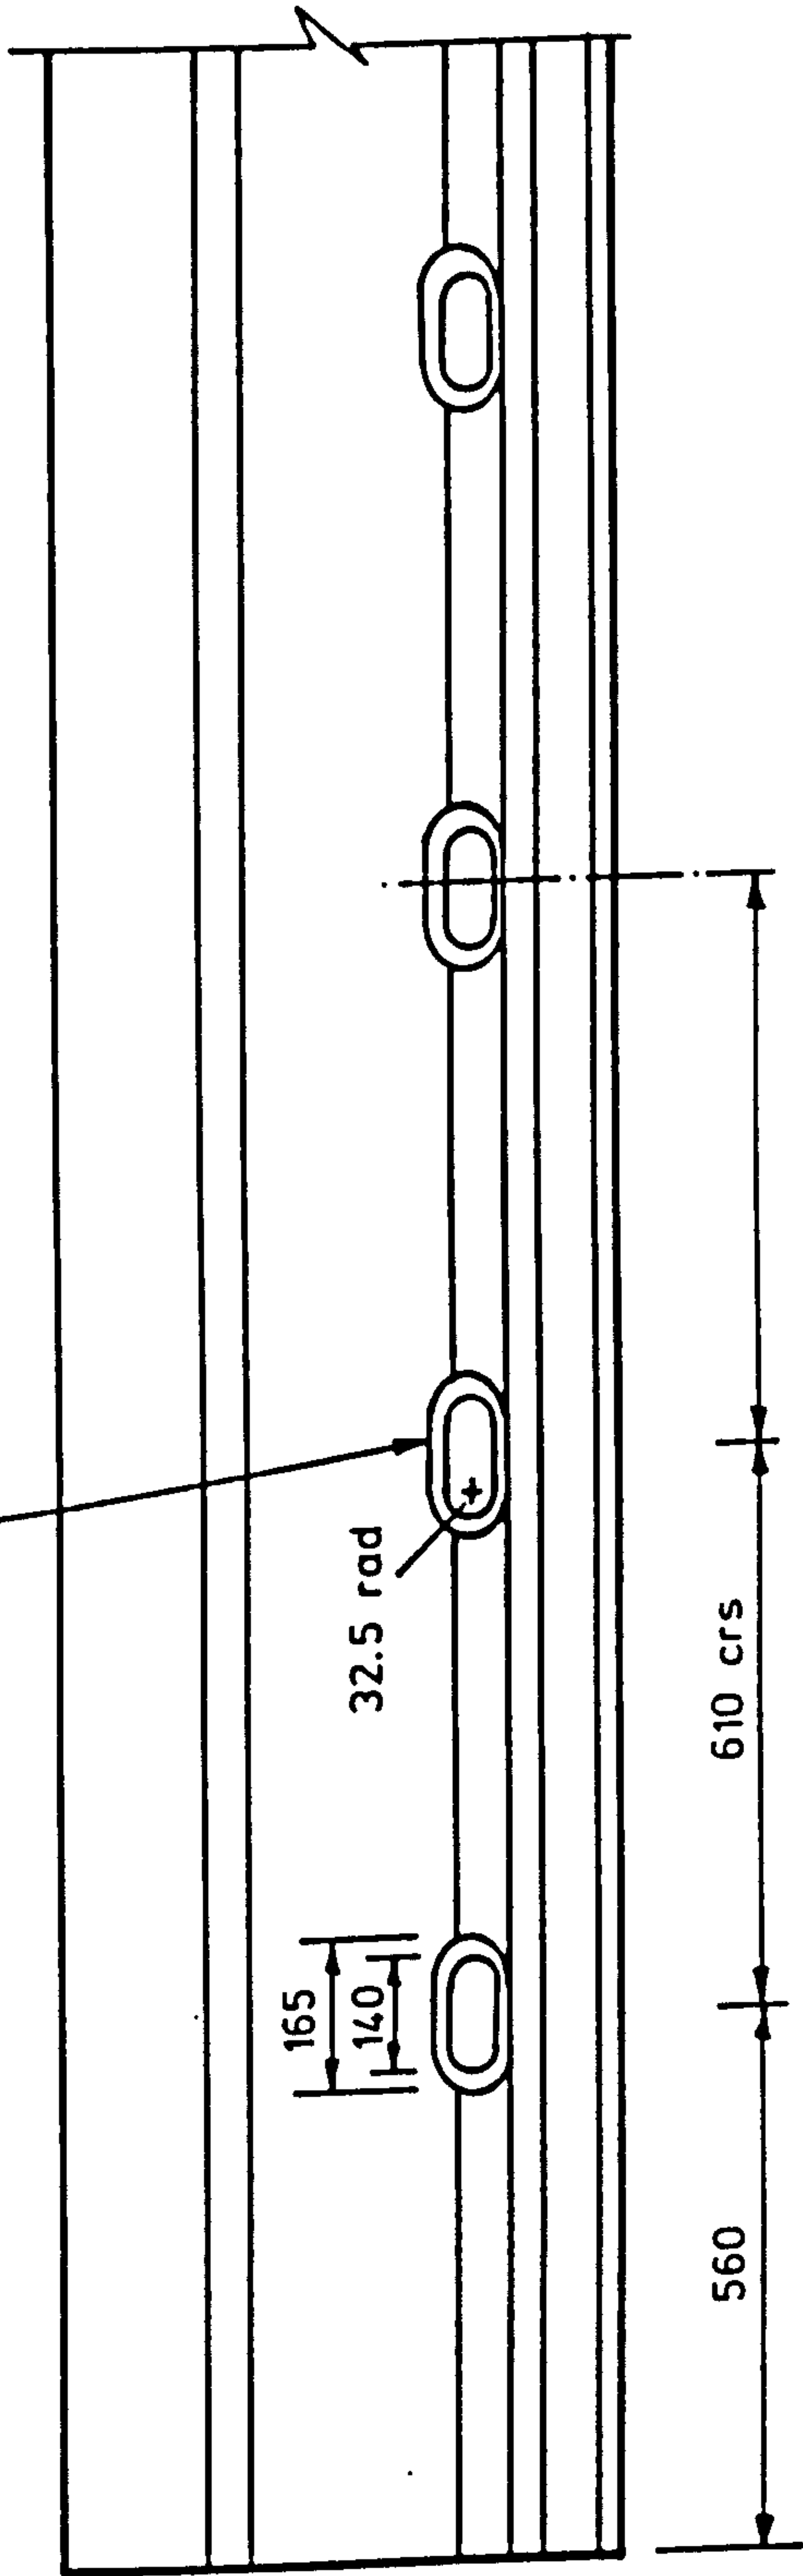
DETAILS OF FULL SIZE BEAM TRANSVERSE HOLE AND SHEAR REINFORCEMENT LAYOUT
